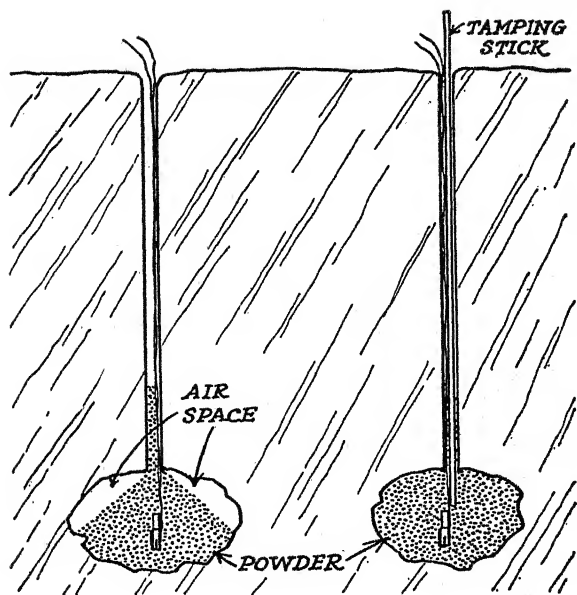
Vertical sprung hole showing (left) chamber not entirely filled with powder and (right) chamber completely filled when powder is properly tamped
